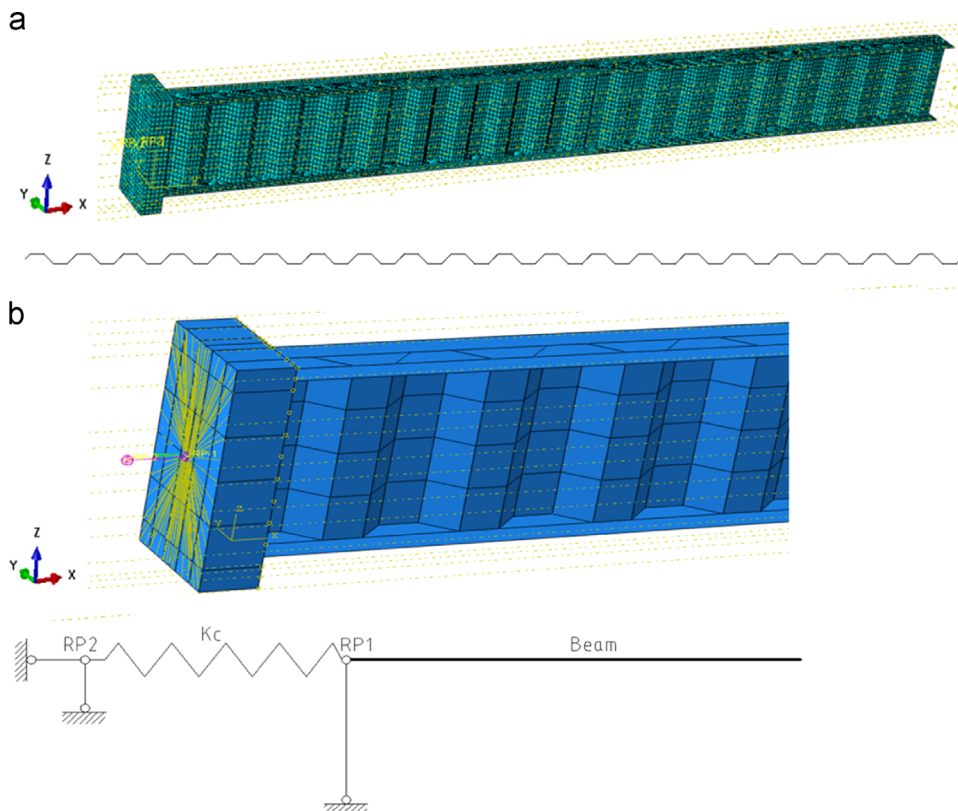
Finite element model of the corrugated web steel beam. (a) Model of CWSB. (b) Boundary conditions of CWSB.
